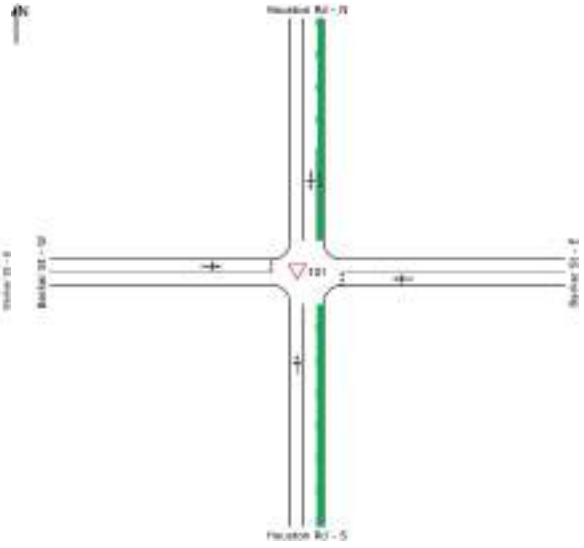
Existing Houston Road/ Borrodale Road layout
